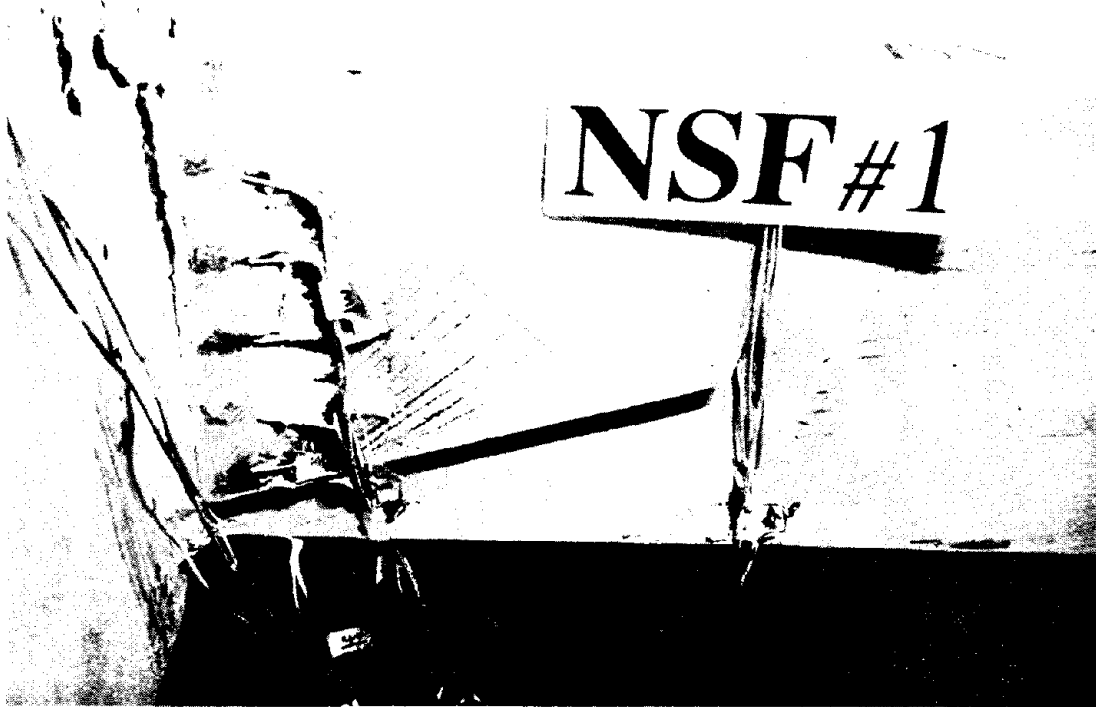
Propagation of Column Crack into the Top Beam Flange and Cover Plate-to-Column Weld Area During 4-in. Displacement, Cycle 1
